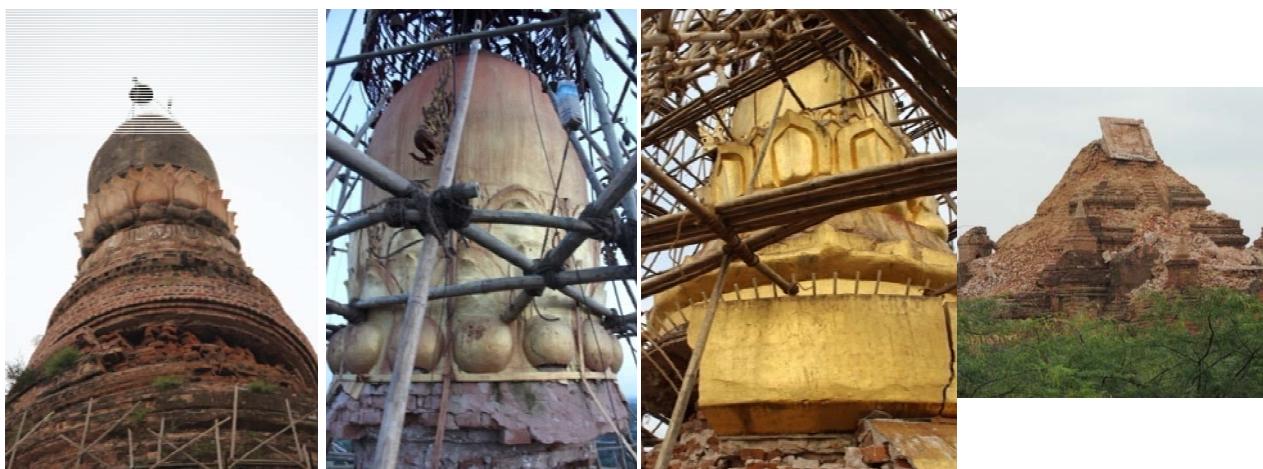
Structures with Heavily Damaged Portions Requiring Careful Removal
